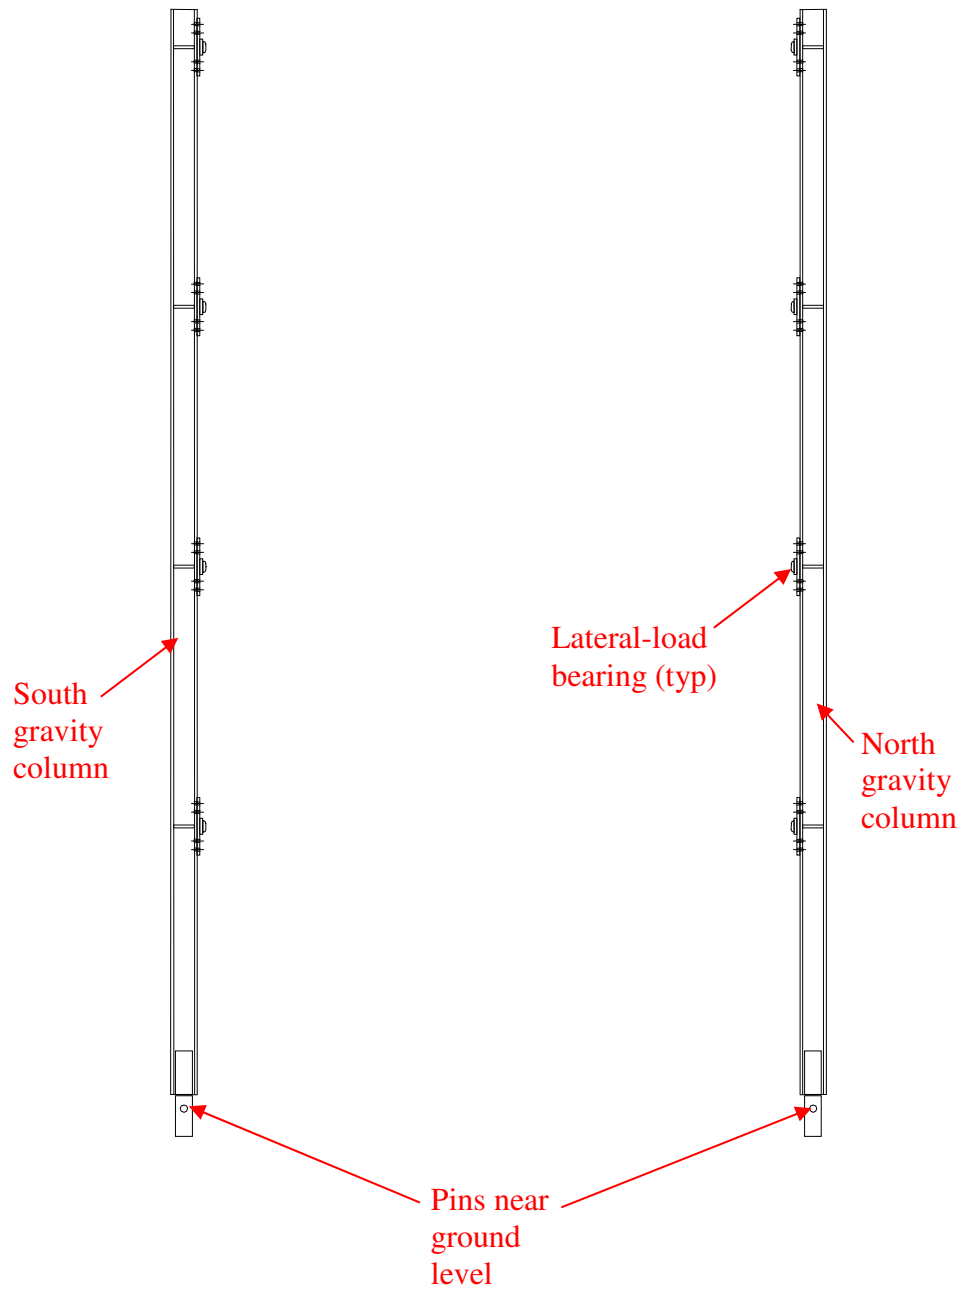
Drawing of adjacent gravity columns for SC-CBF test structure
